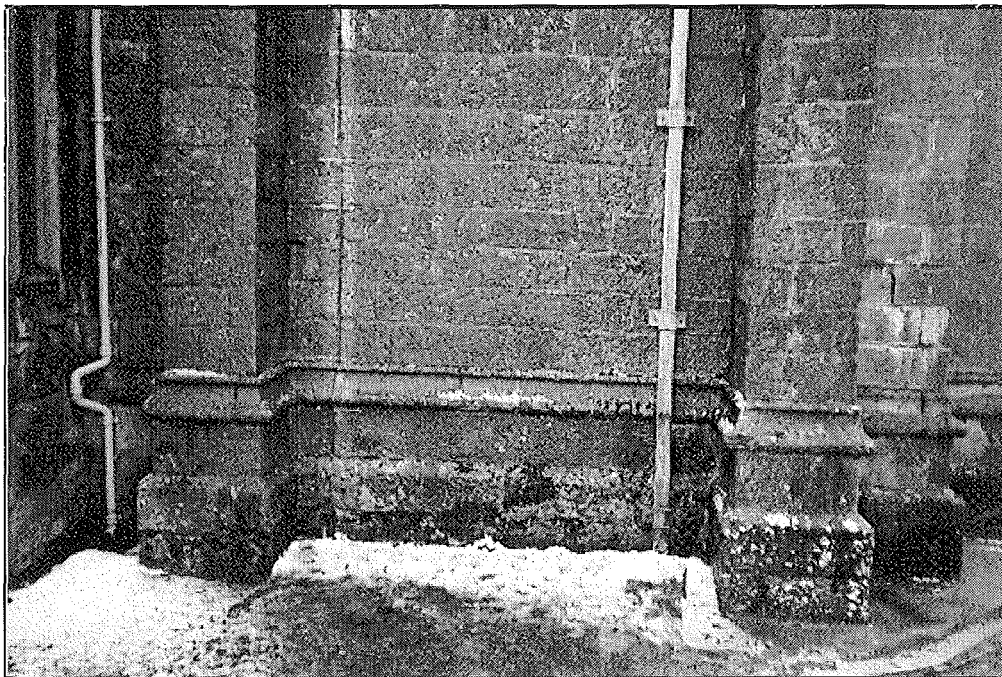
Widecombe-in-the-Moor church, north facing wall.
